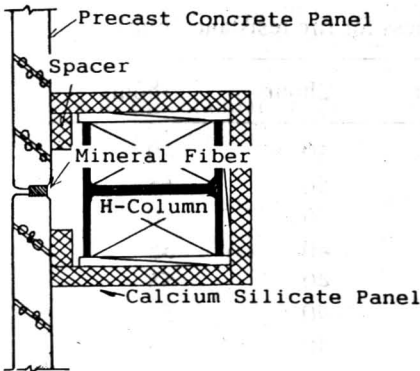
Details of Precast Concrete Panel and Calcium Silicate Panel Composite Fire Protection.
